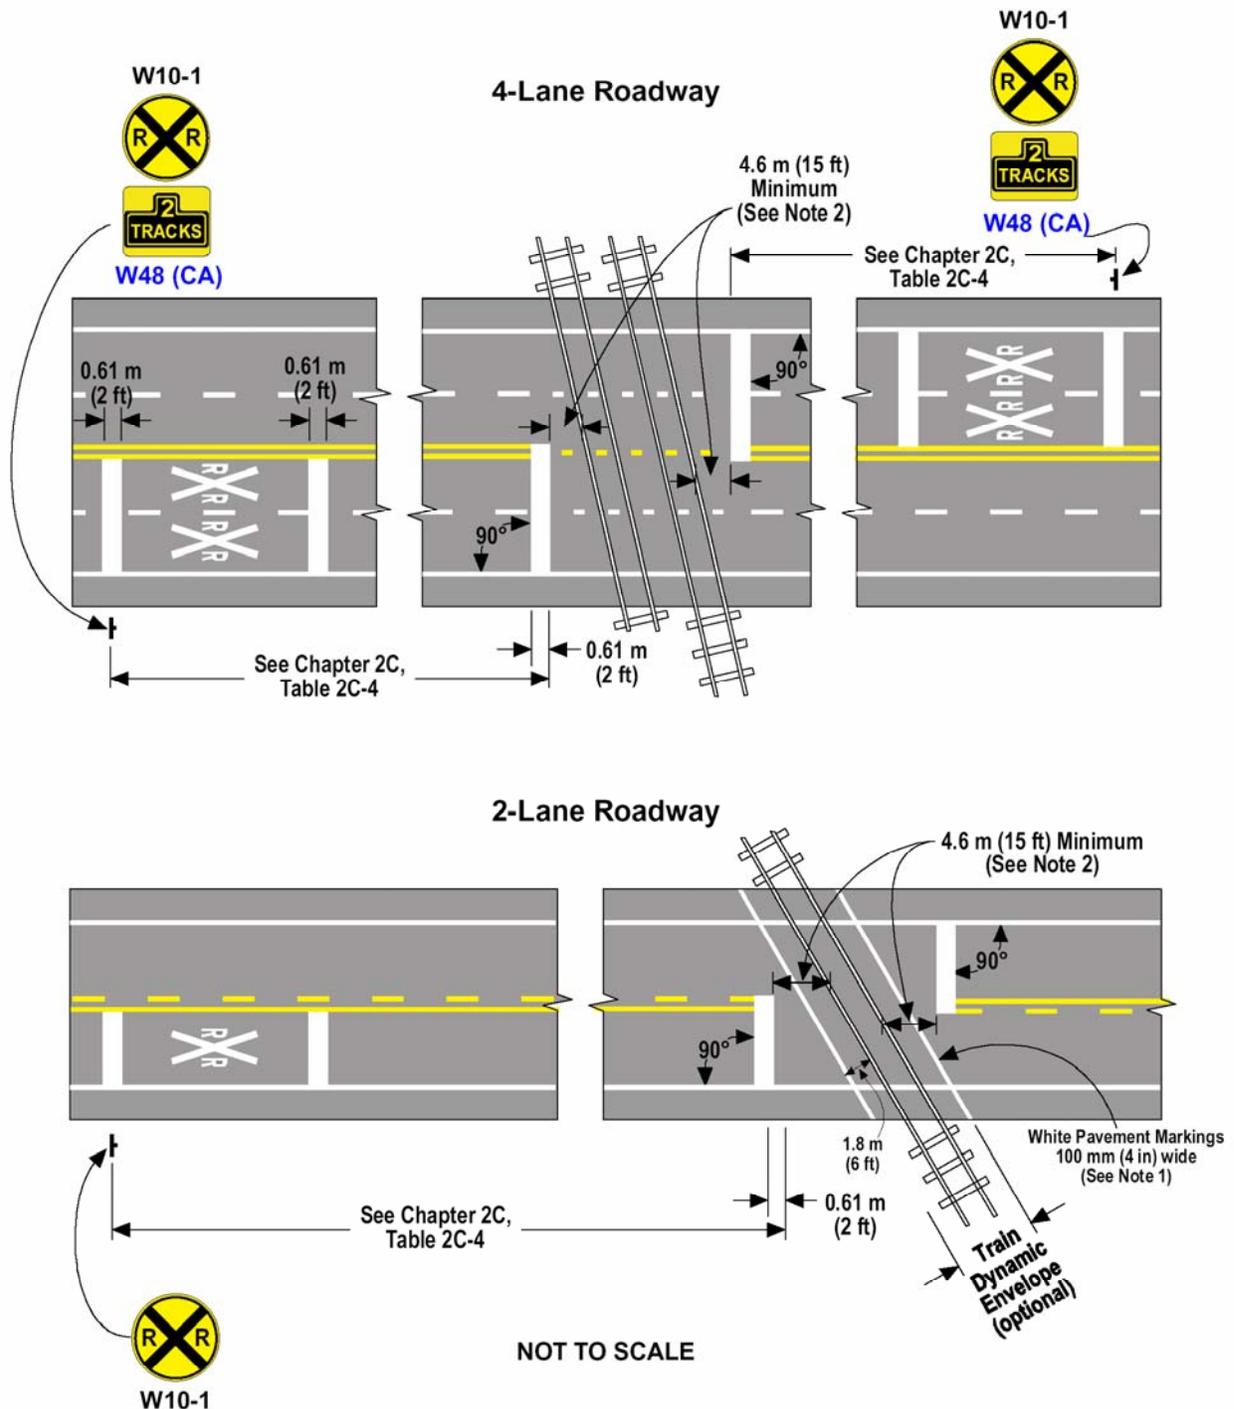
B-6 (CA). Example of Placement of Warning Signs and Pavement Markings at Highway-Rail Grade Crossings (Sheet 1 of 3)
